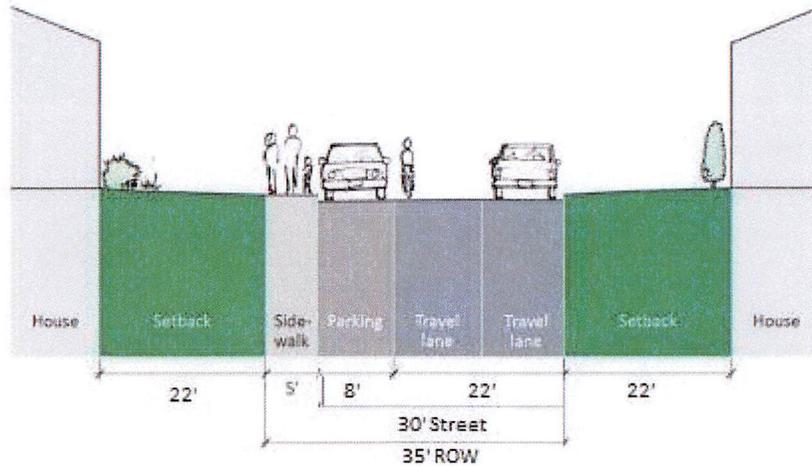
(B)-2 Continued: Cross-sections for local access street design options (with standard dimensions)
